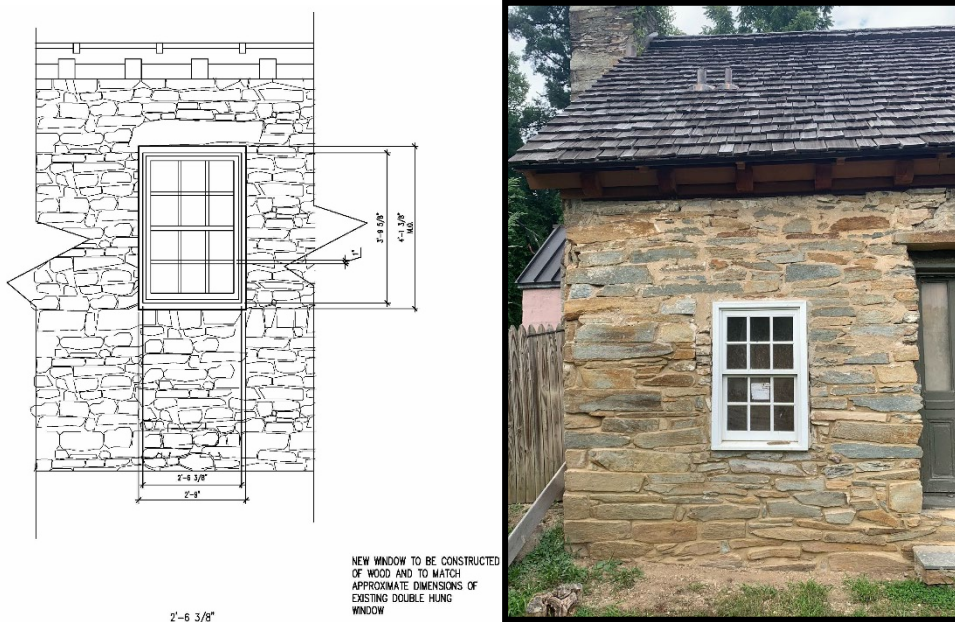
The drawing for the 6/6 window on the front elevation and a recent photo of it.
